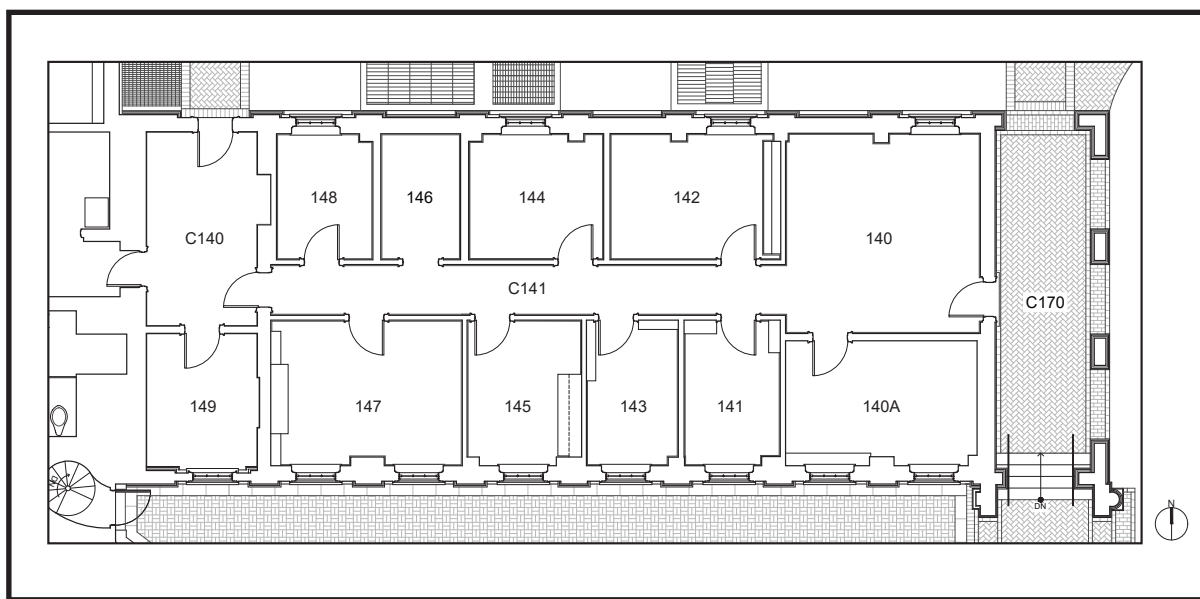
Detail of ground-floor plan of the northeast wing (not to scale).
